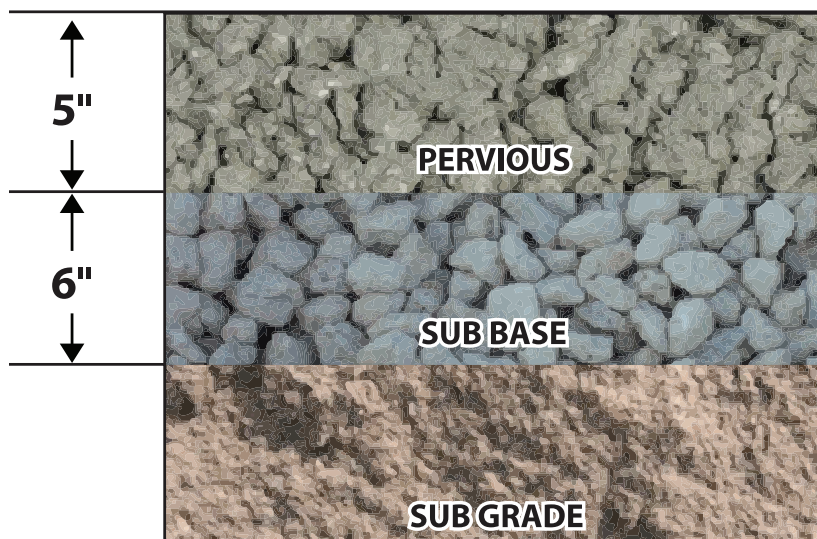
Pervious concrete. (Note: 1 in. = 25.4 mm.)
